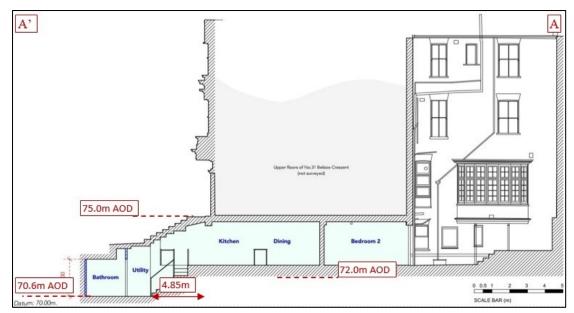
Proposed Cross-Section (Extract from P-AD Architects Drawing: 7335/08 Rev B)
